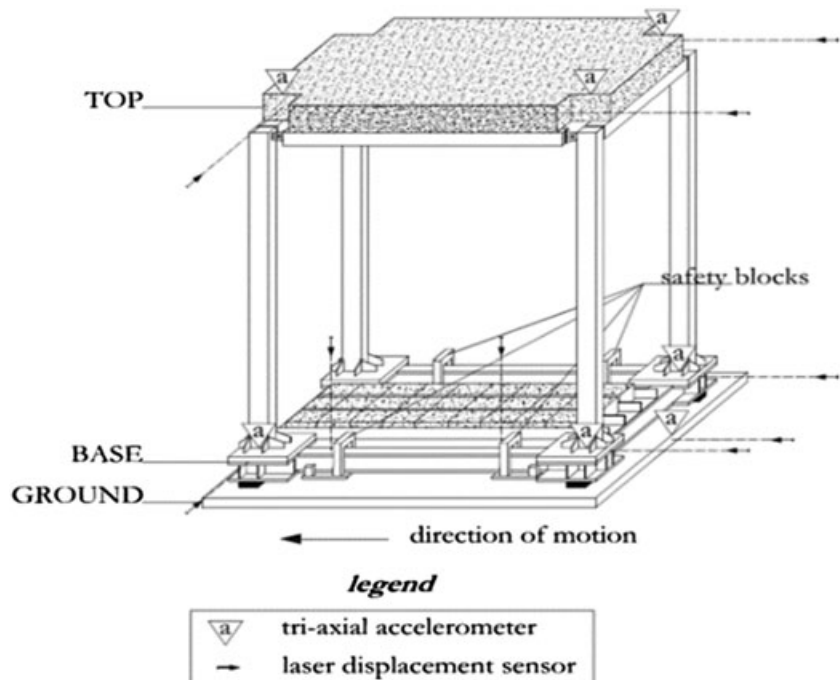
Scheme of the prototype building and the instrumentation setup
